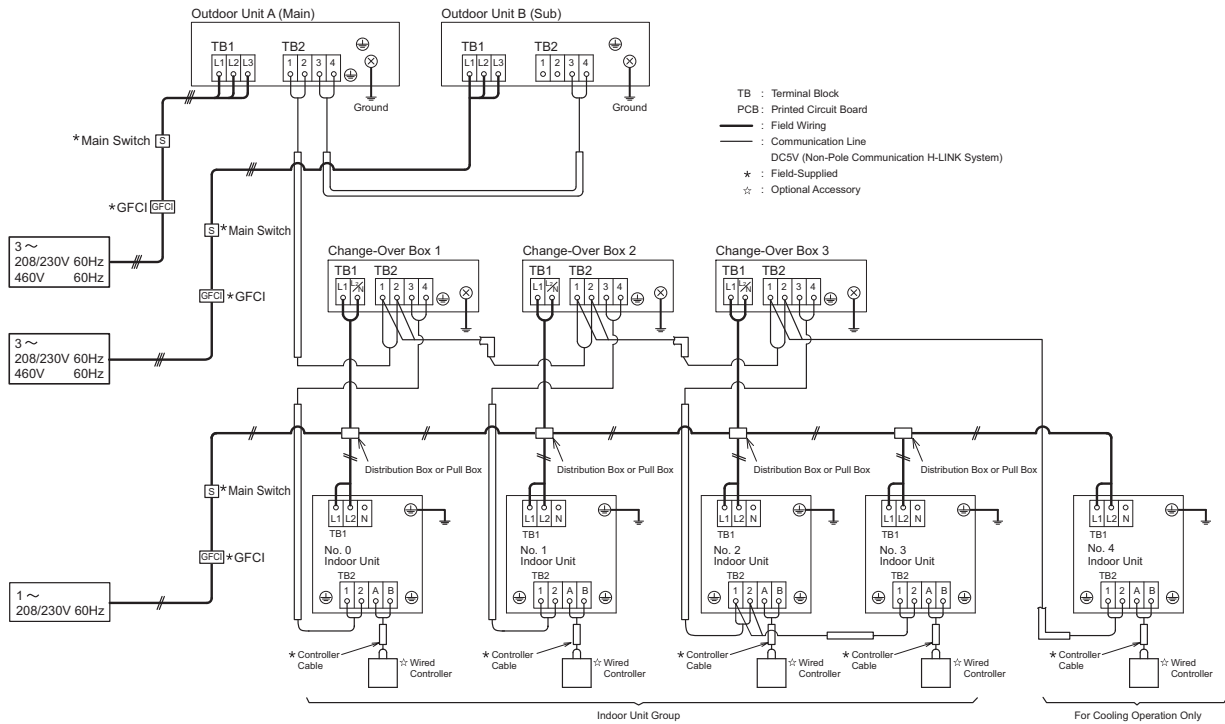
Instruction for Electrical Wiring Connection (Heat Recovery System)
